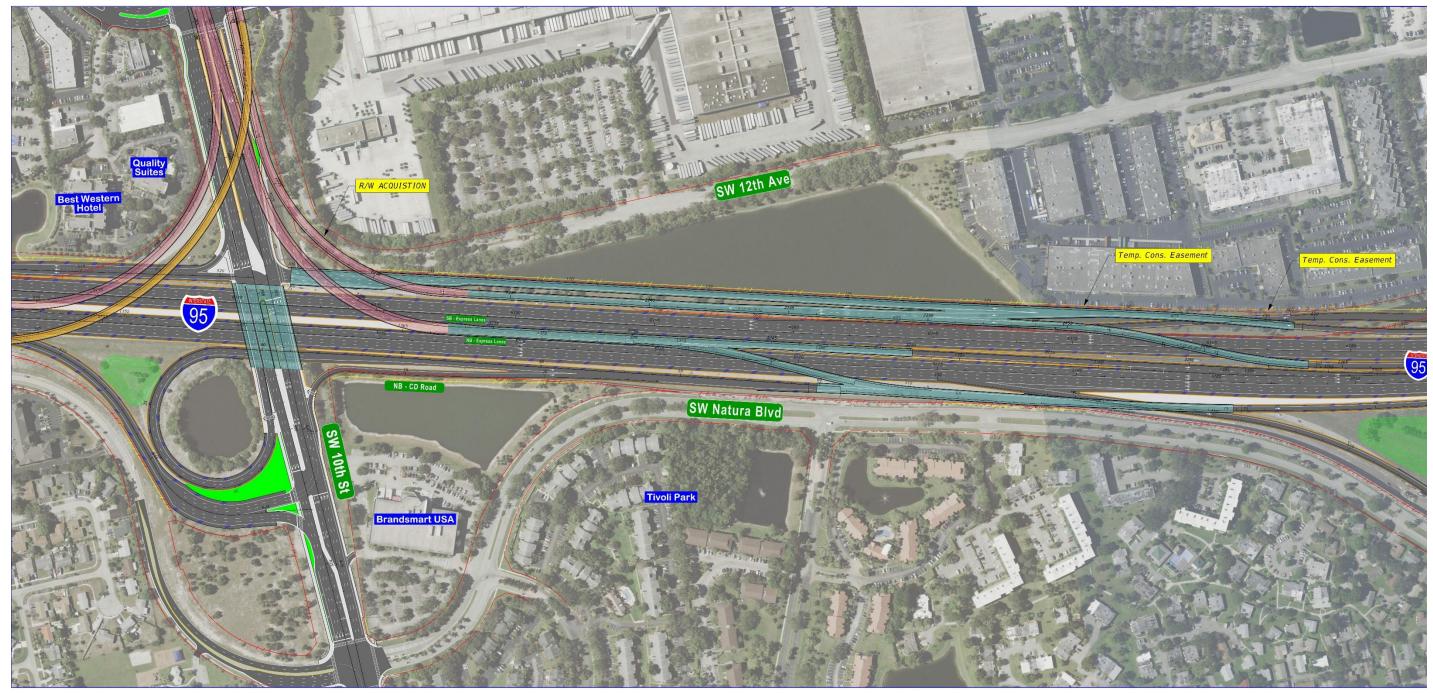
3: Alternative 2 Concept Plan (North of SW 10th Street) (1 of 2)
